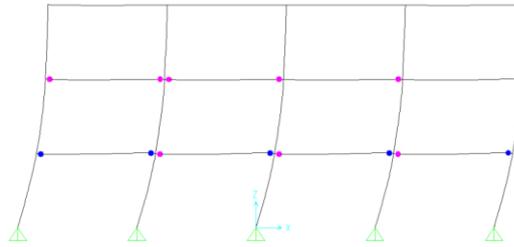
b Plastic hinges in RC building propagates to the at beams upper story
